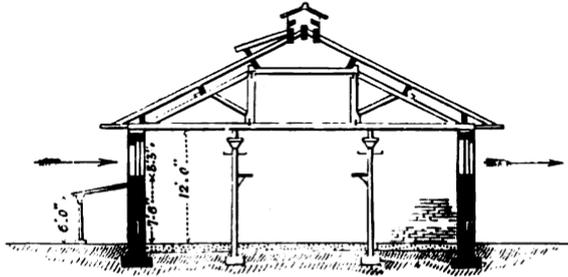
Transverse section of stable. Two horses are placed between opposite windows, heads to outer walls. The arrows indicate the direction of the wind.
